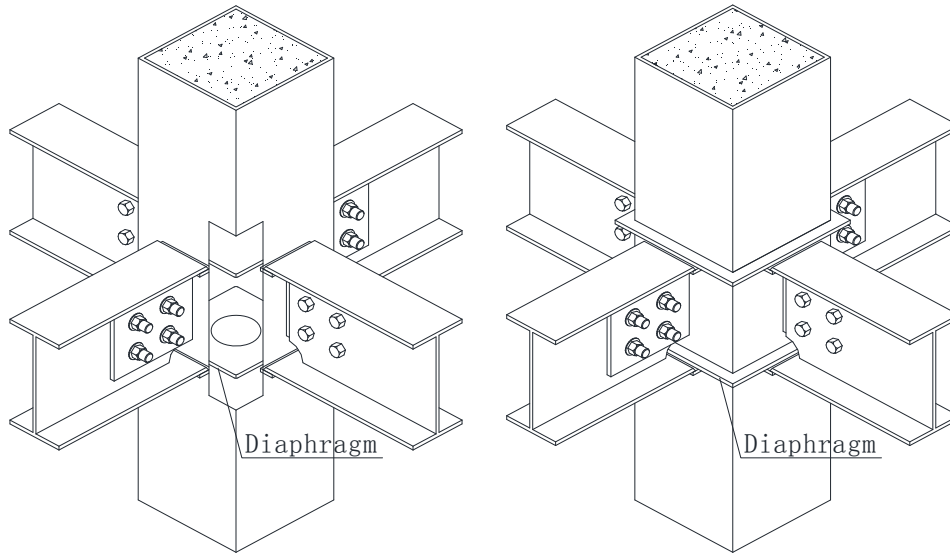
Joint forms: inner diaphragm joint (left) and diaphragm-through joint (right).
